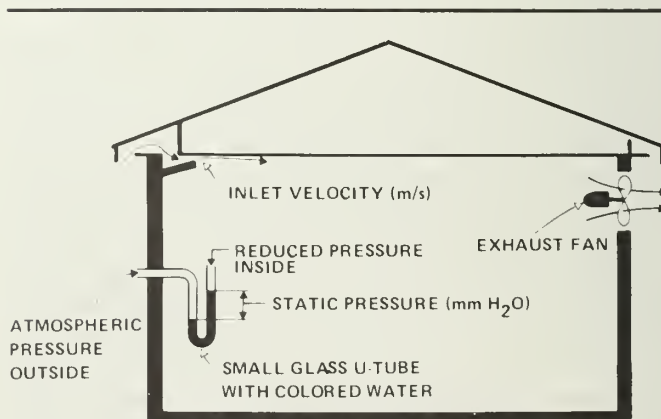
A slant-tube manometer is used to measure negative pressure for accurate air inlet adjustment to insure jetting.
